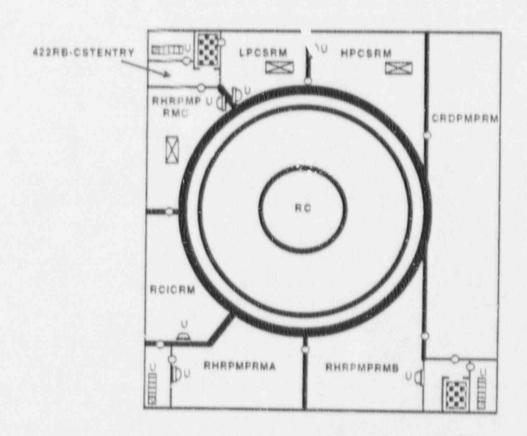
WNP-2 Reactor Building Elevation 422'3"
